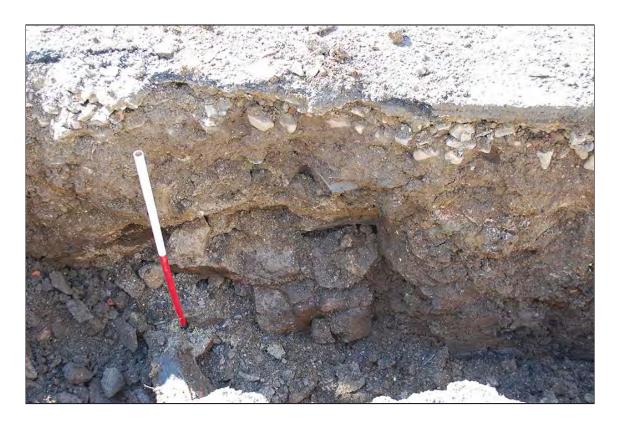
View of wall [151] visible in the section of the drainage trench excavated to the south of the Bishop's Palace. Scale 1 \times 1m; view from the northeast
